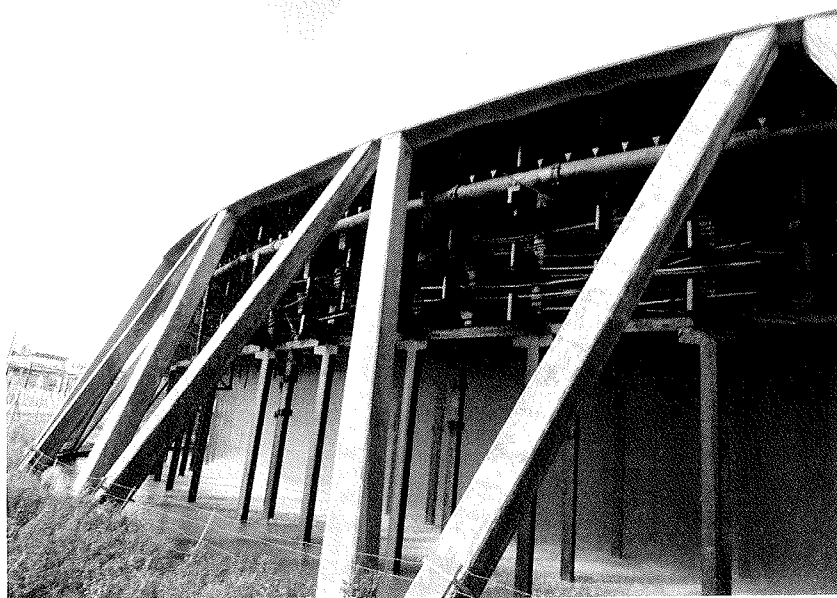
Base of tower with inner diffusing system: pre-cast concrete columns and beams supporting a lattice of slats acting as direction diffusers
